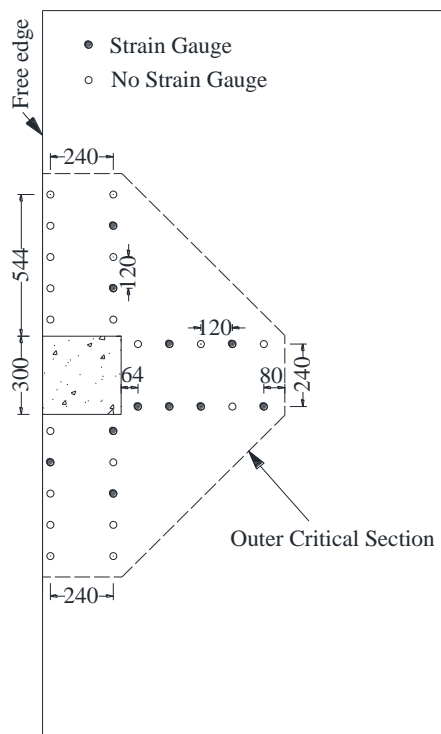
Dimensions and flexural reinforcement layout of connection H-1.8-XX (all dimensions are in mm)
